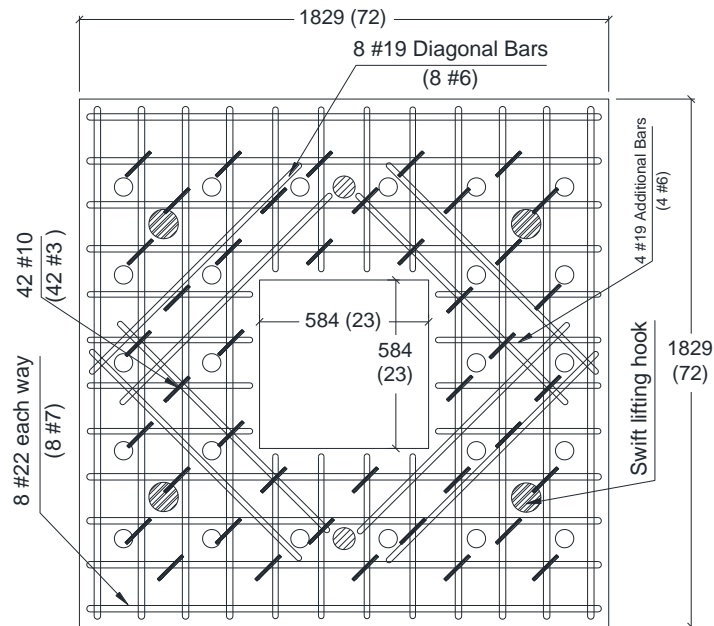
Details of the top reinforcement in the footing of the single column model [units are mm (in)]
